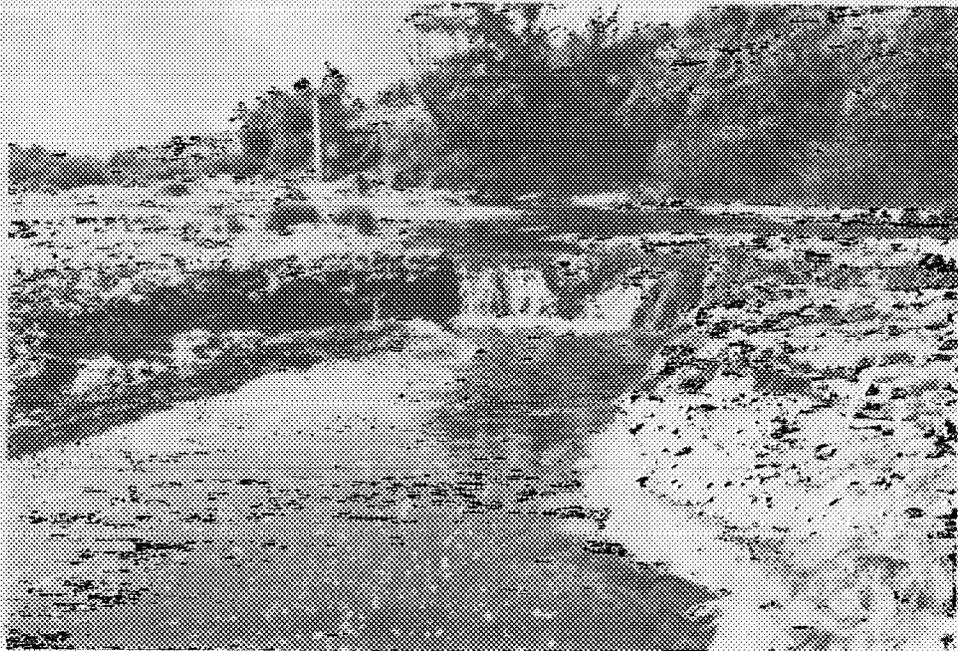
ROCK REMOVAL AS CONSTRUCTED
